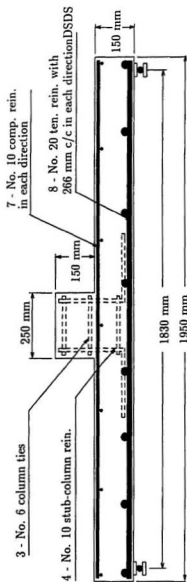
Dimension and reinforcement details of a reference slab (HS19)
